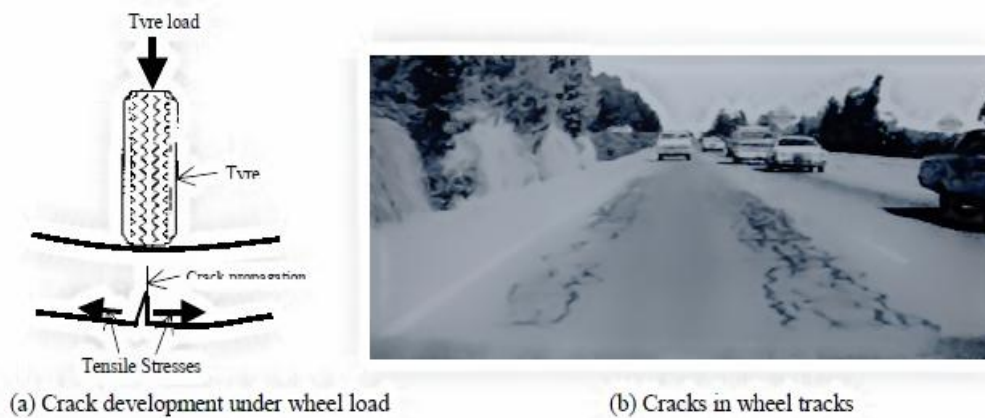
Cracks due to fatigue stresses on pavement layer [1]
